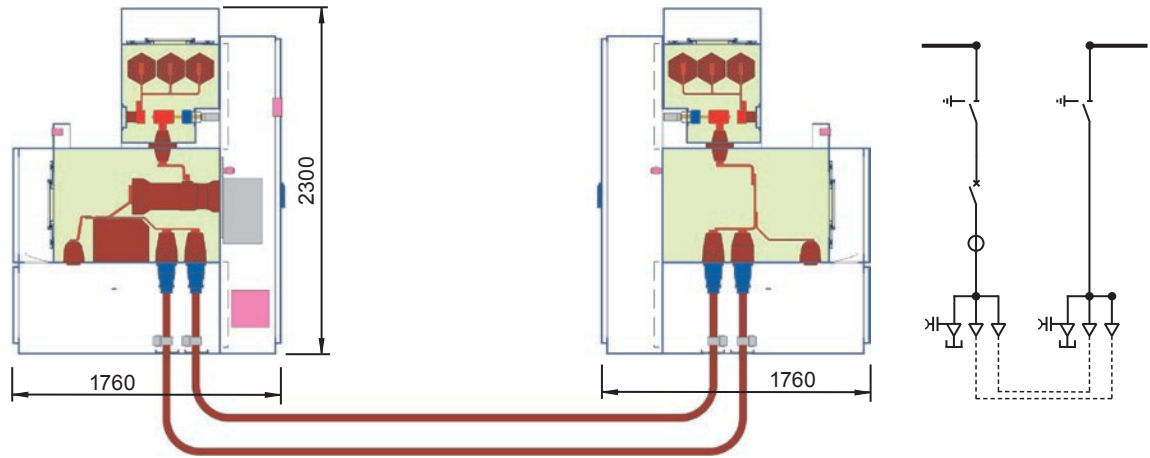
Sectionaliser by cables, 1250 A
